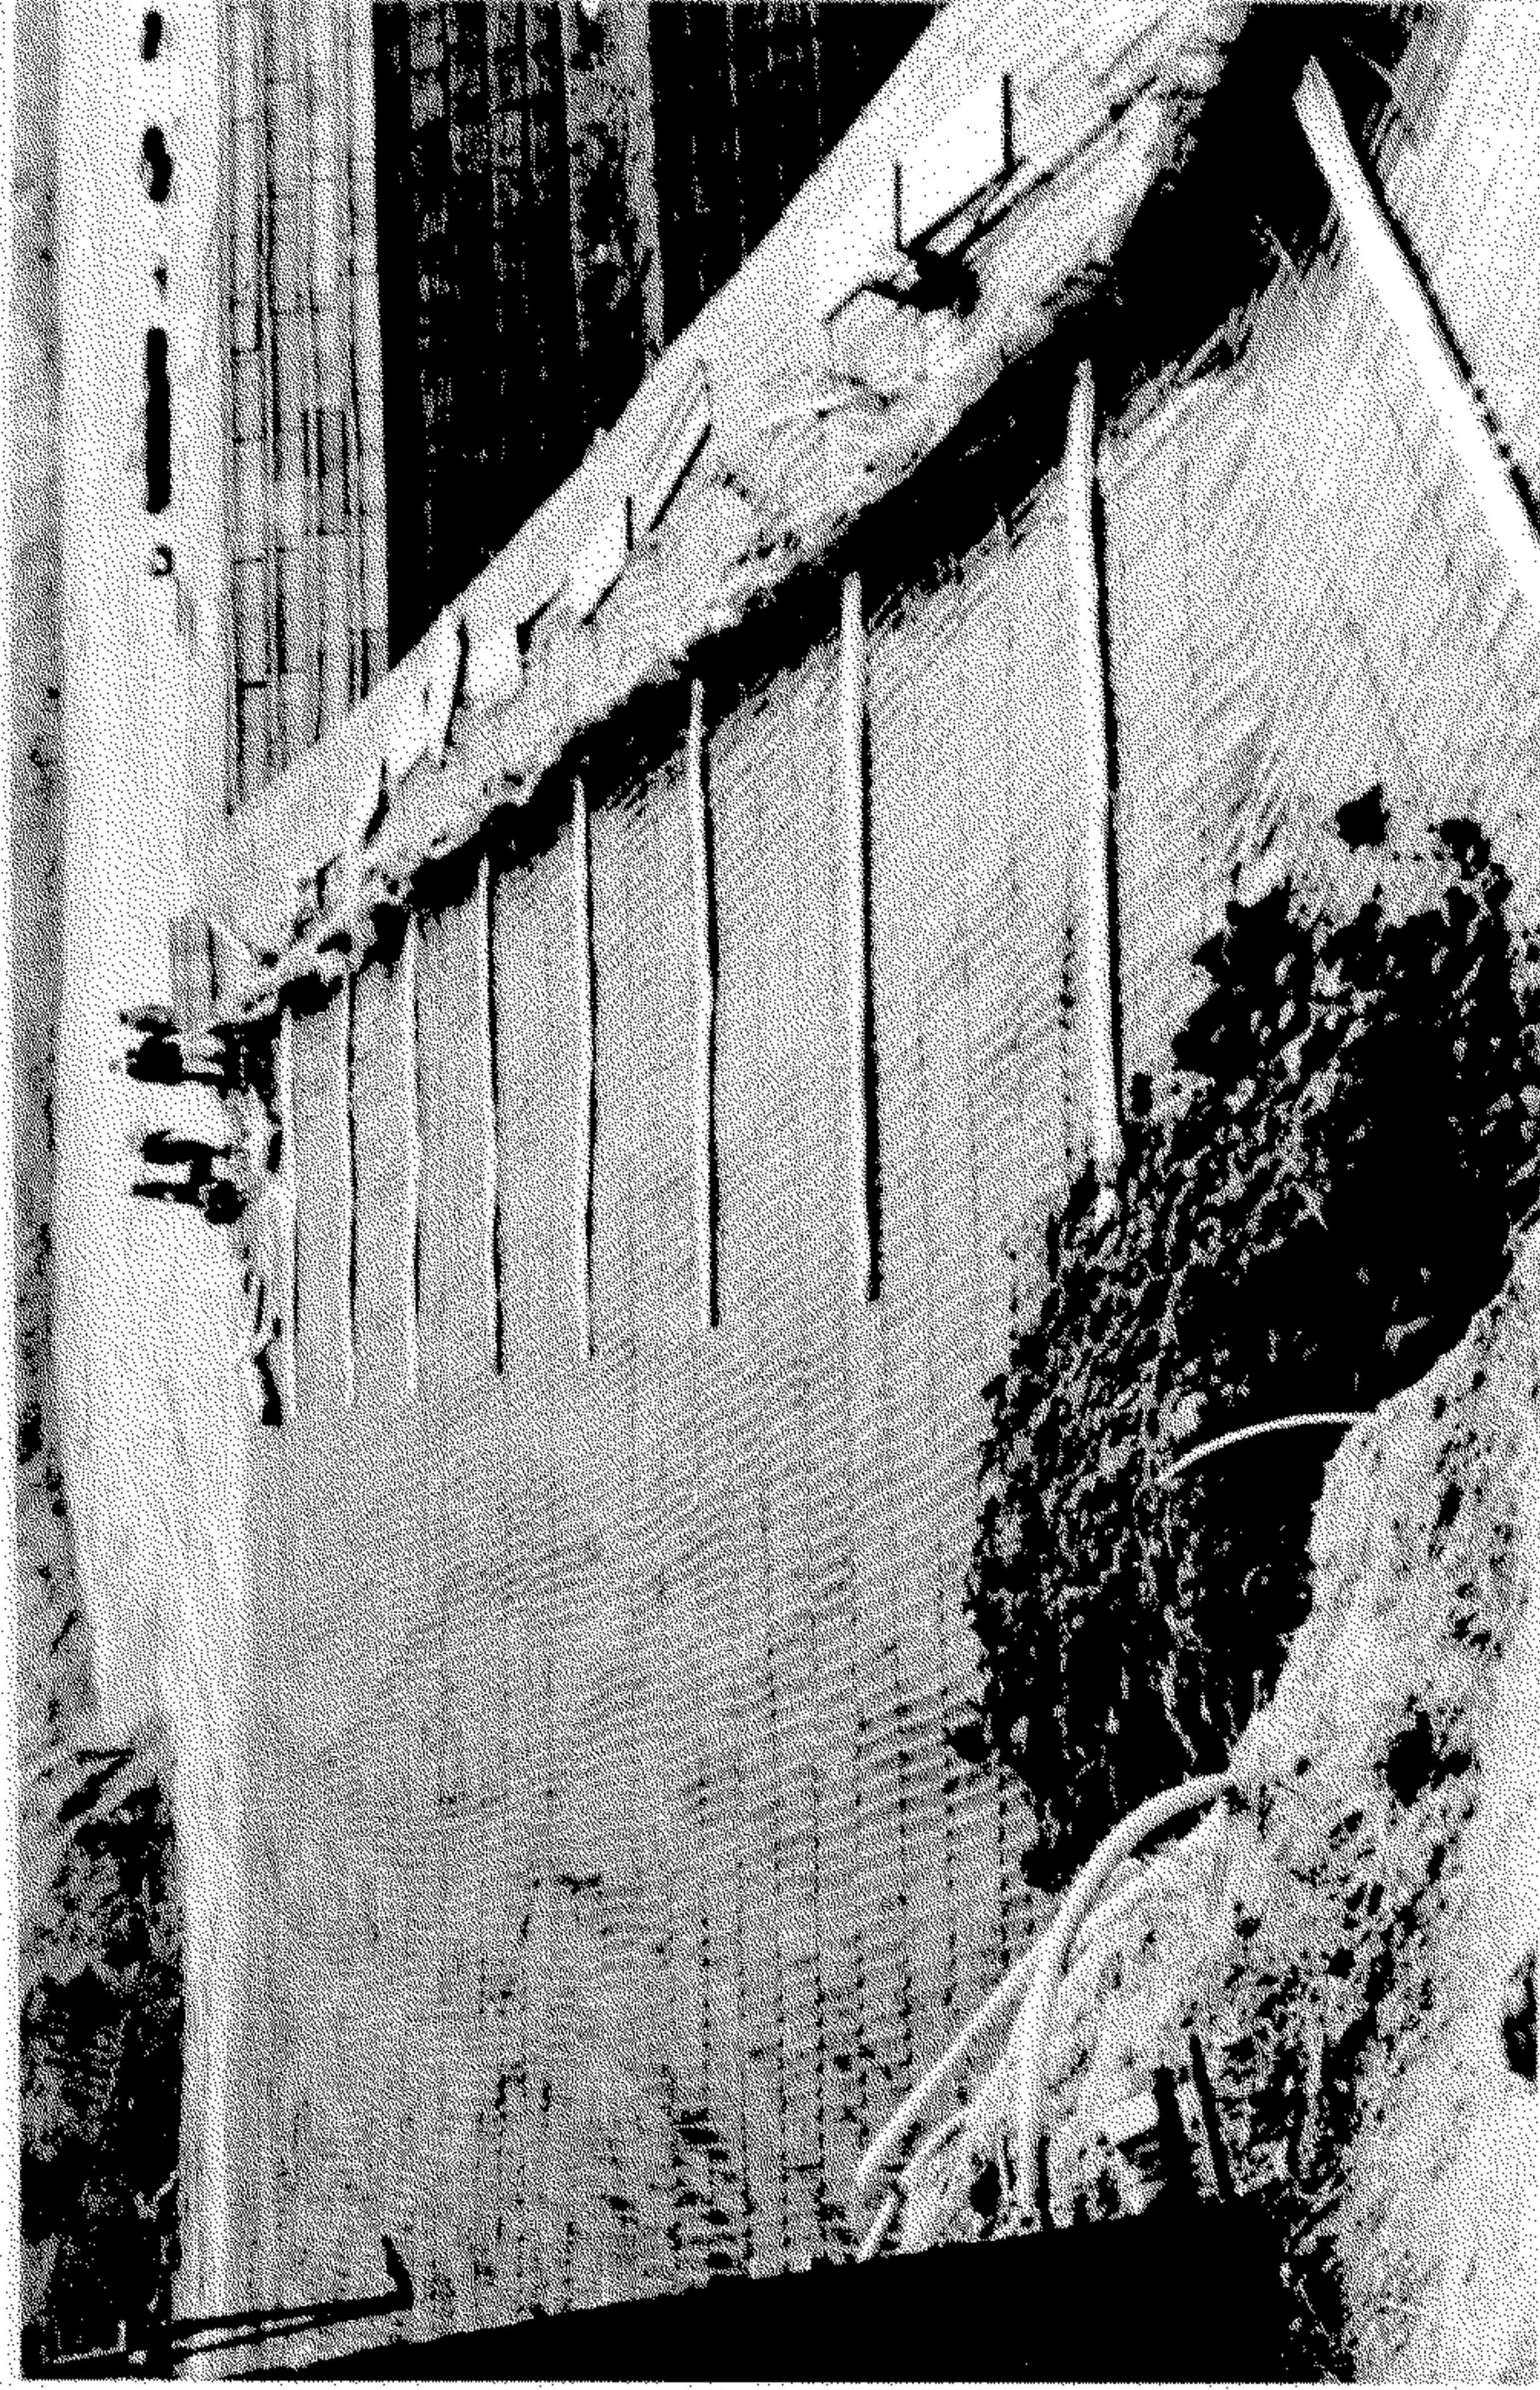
View of the wall during construction, showing the geogrids and the edge drains for face drainage
